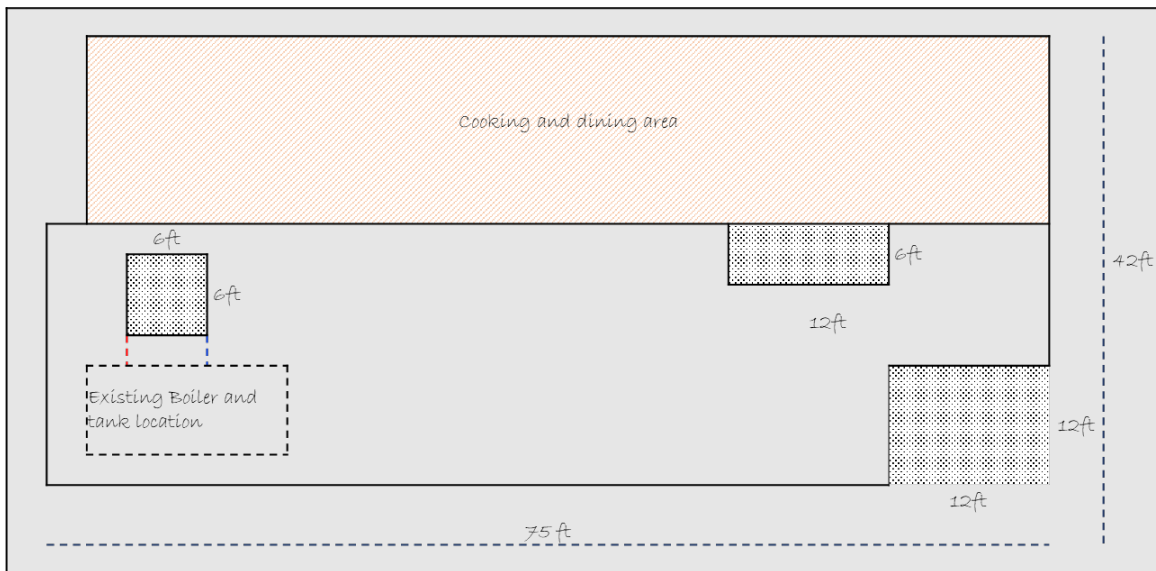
Potential Locations of Gas Heat Pump on Ground-Level (Left) and Rooftop Options at Site #1A
